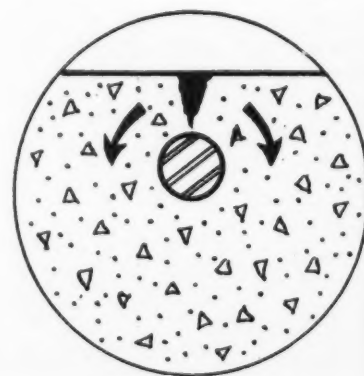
Shrinkage of concrete around reinforcement can cause cracking.
